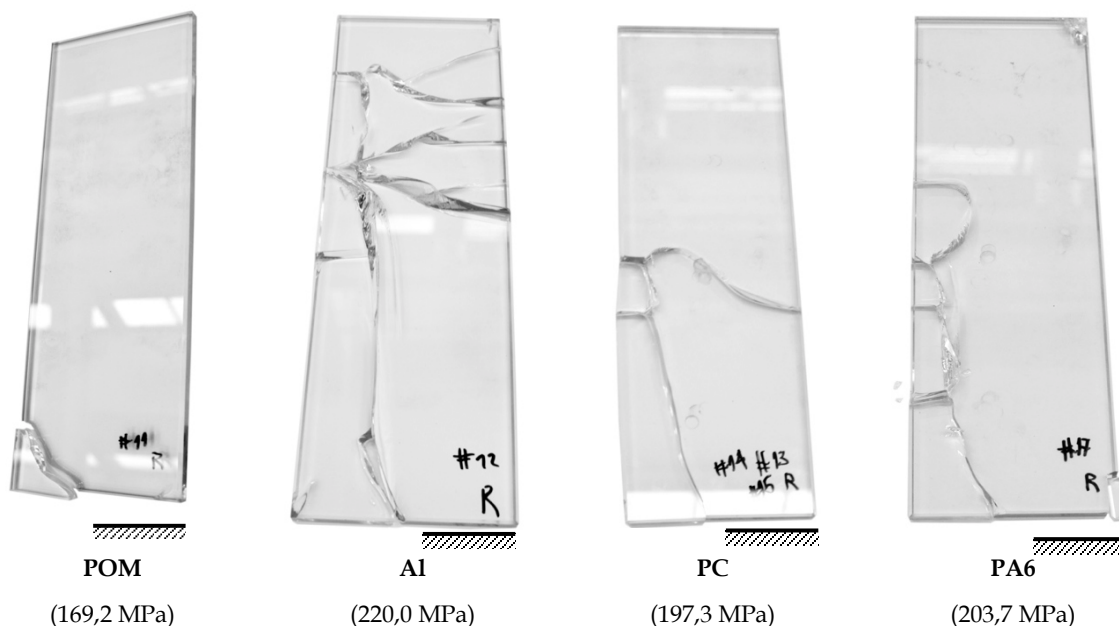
Fracture pattern of annealed glass specimens in contact with POM, Al, PC and PA6.
